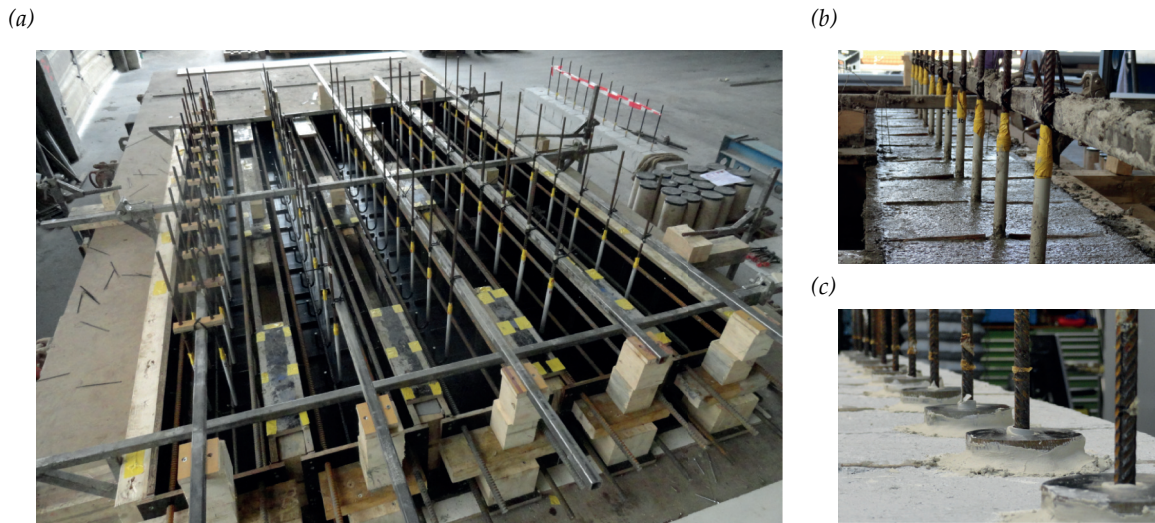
Production of the concrete specimens: (a) formwork with disposition of the anchorage details and steel inserts (bottom and laterals); (b) casting of the specimen and disposition of the steel top inserts; and (c) preparation of specimens prior to pull-out test with installation of load introduction steel plates with plaster to adjust the surface asperities
